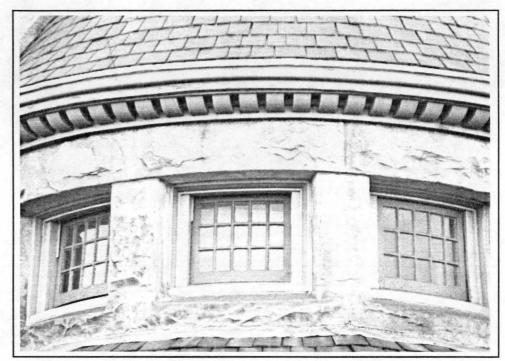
Upper round tower details, pivotal multi-light windows, dentil course
